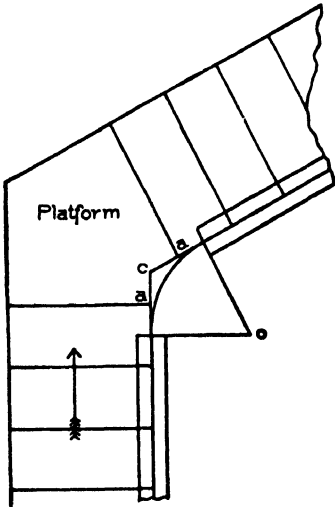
Arrangement of Risers in Stair with Obtuse-Angle Plan
